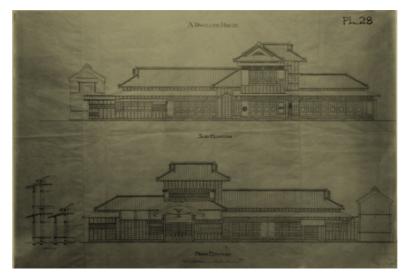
A DWELLING HOUSE SIDE ELEVATION and FRONT ELEVATION.
